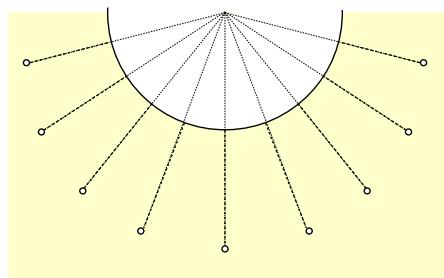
Excavation: water tight geotextile reinforcement + sealing
